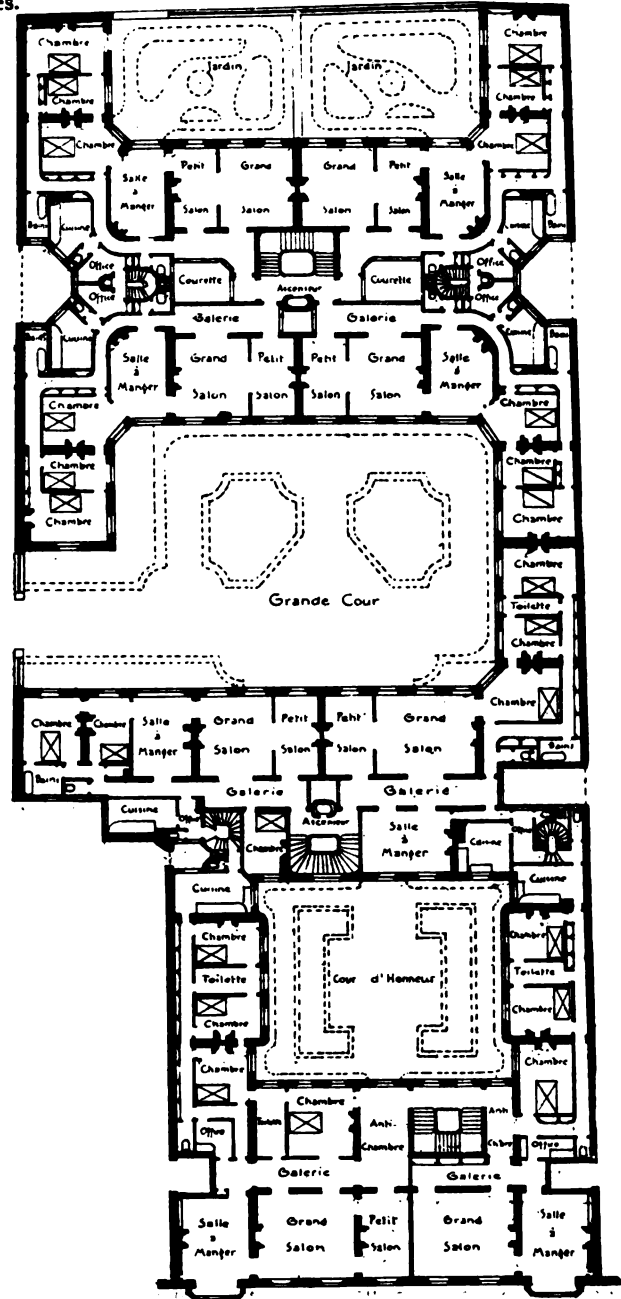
PLAN OF APARTMENT-HOUSE ON THE BOULEVARD SAINT MICHEL, PARIS. M. NERROT, ARCHITECT.
